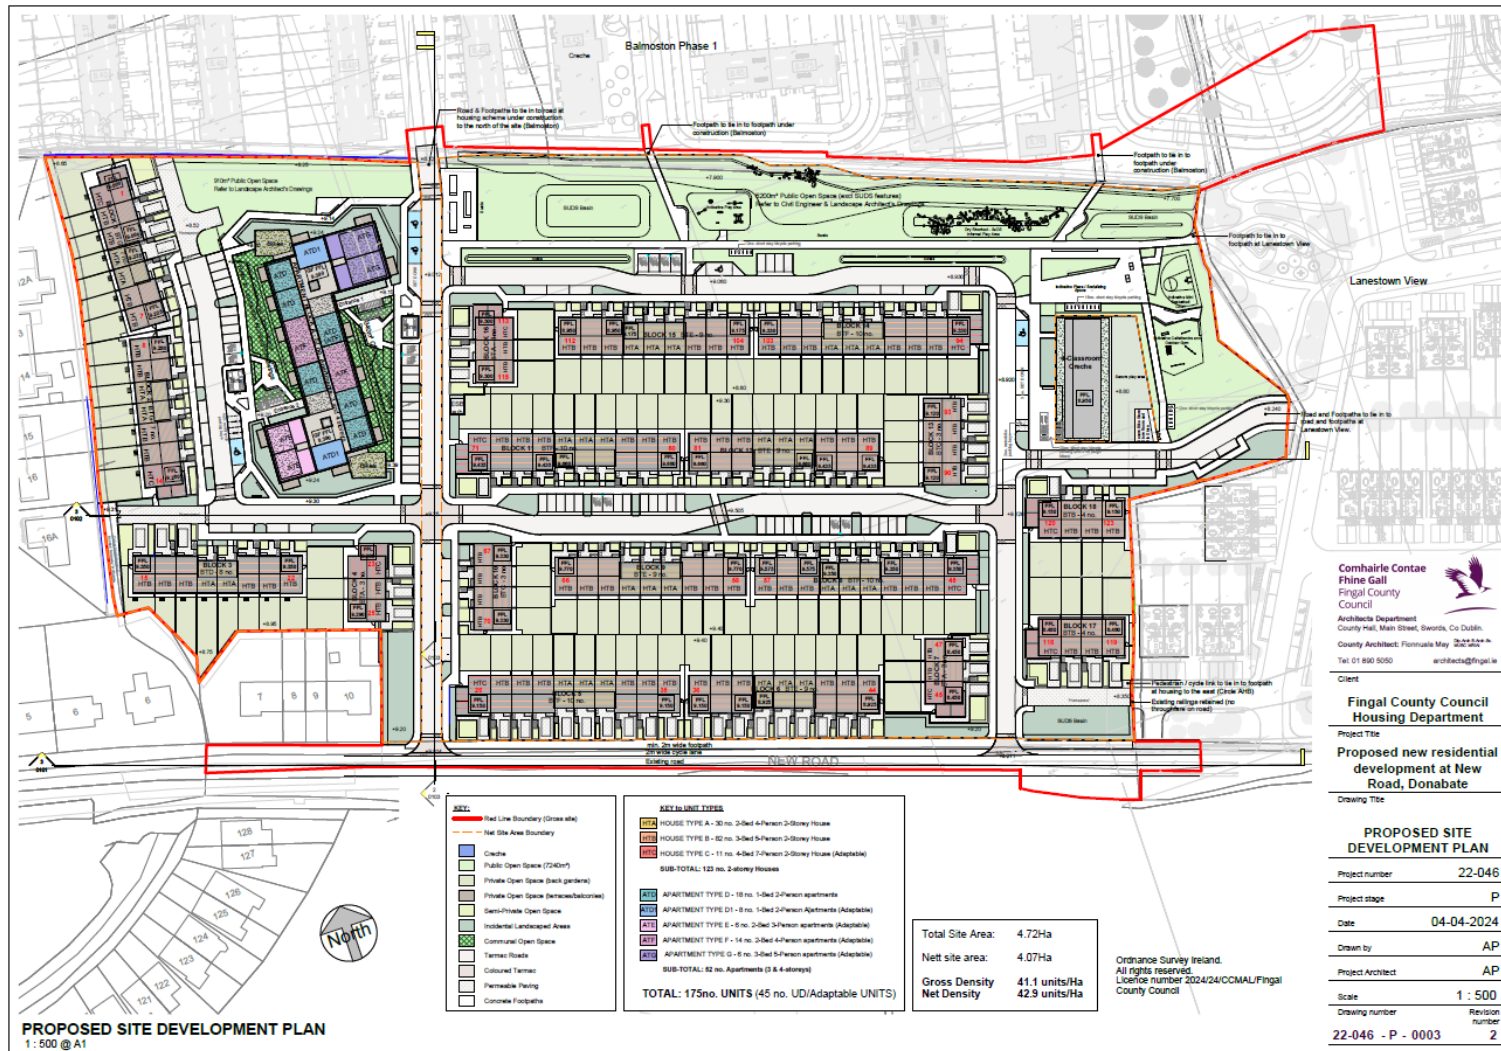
PROPOSED SITE LAYOUT (FINGAL COUNTY COUNCIL, 2024. DRAWING NO. 22-046-PP-0003).
